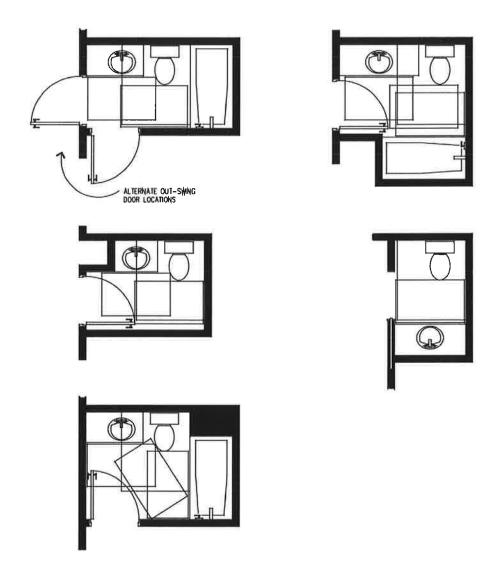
EXAMPLES OF BATHROOMS WITH FLOOR AREA TO SUITE "MINIMALLY ACCESSABLE" REQUIREMENTS
